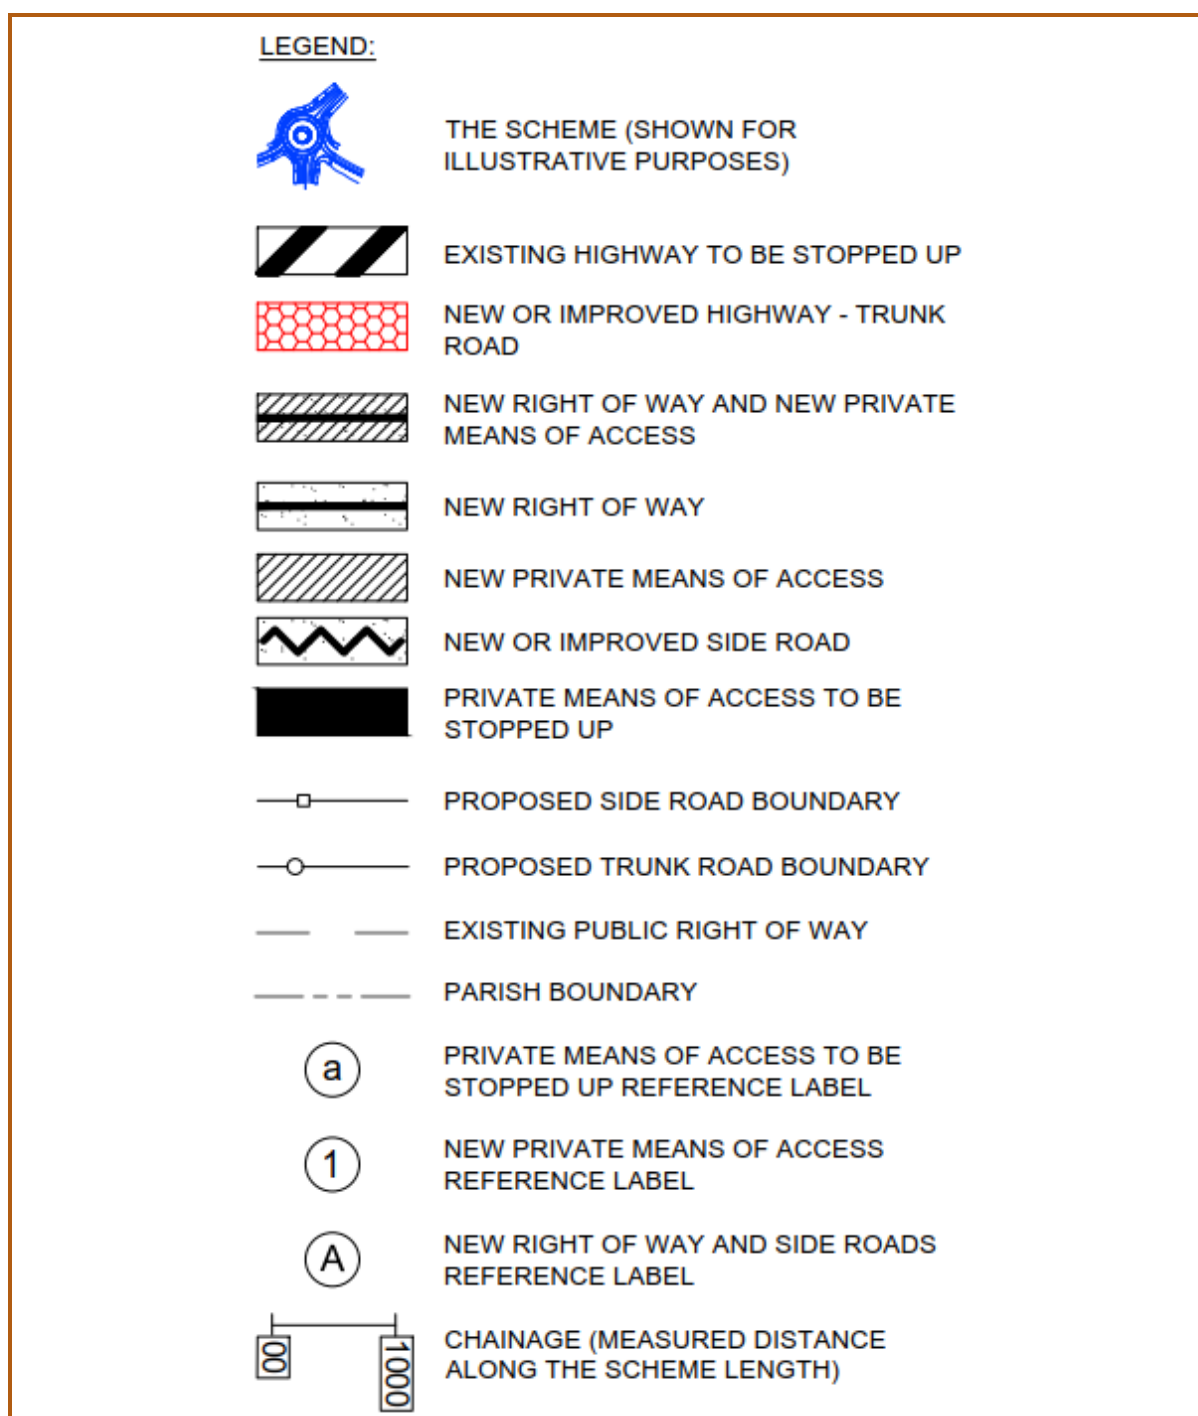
Extract from Rights of Way and Access Plans [APP-009]
